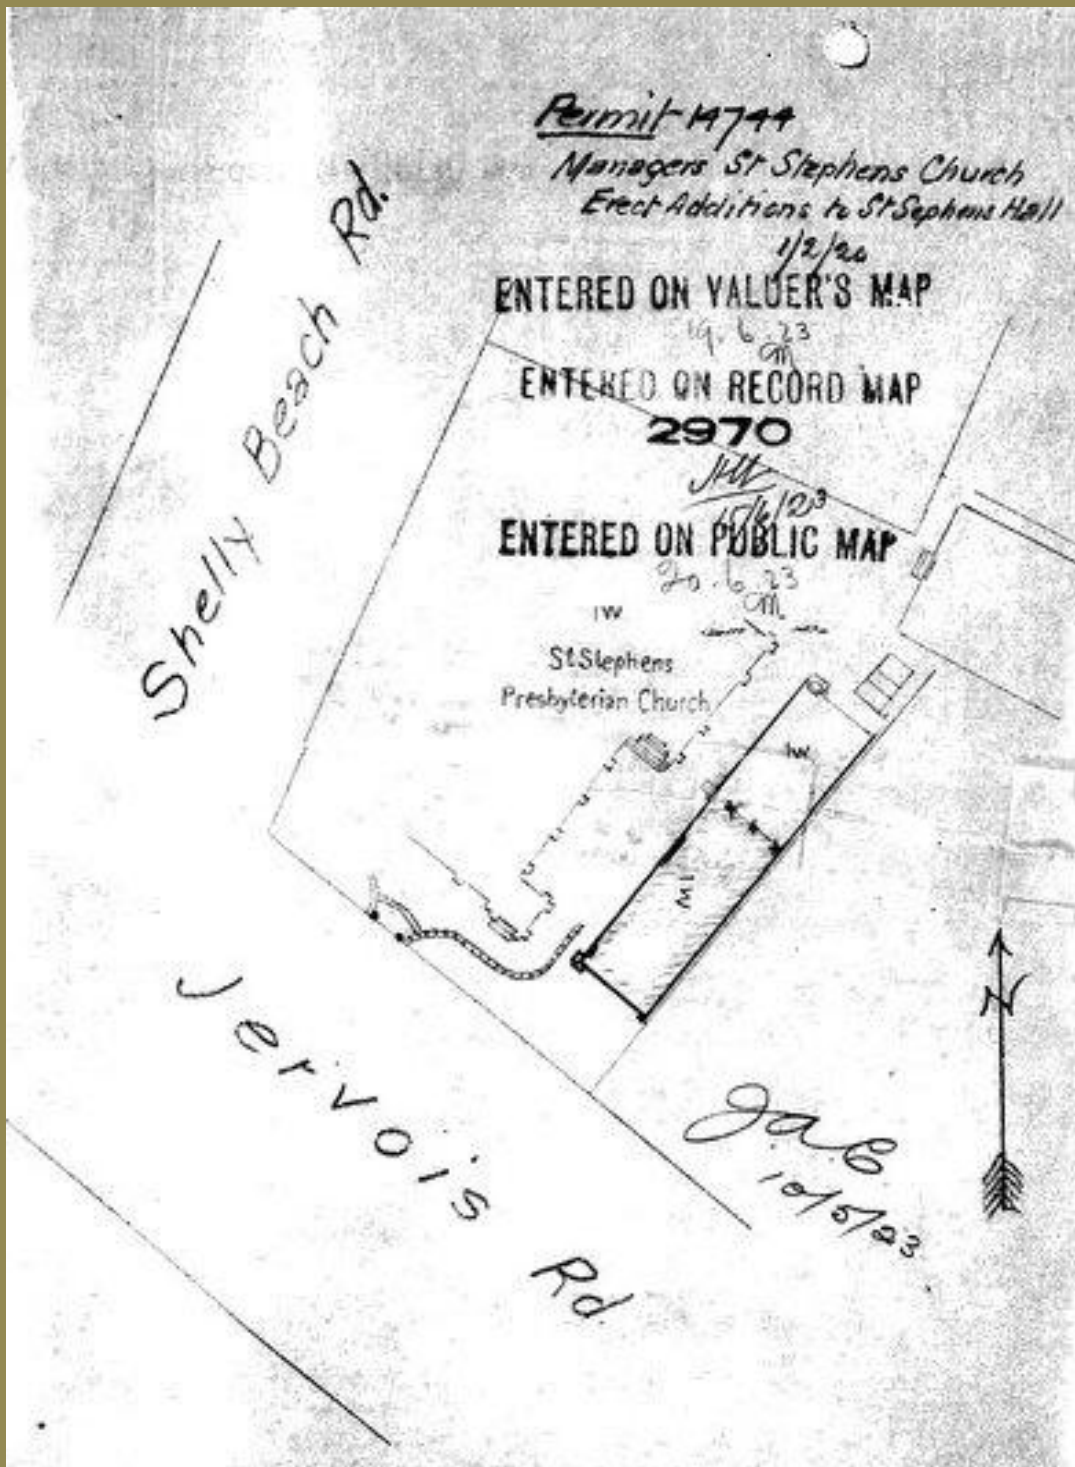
Site Plan dated 1923, showing the east side of the church and the curved landscaped wall (built between 1910 and 1923), the classrooms built in 1914 and 1920 (now the church lounge since the 1994 alterations) and the west side of the 1908 hall.
